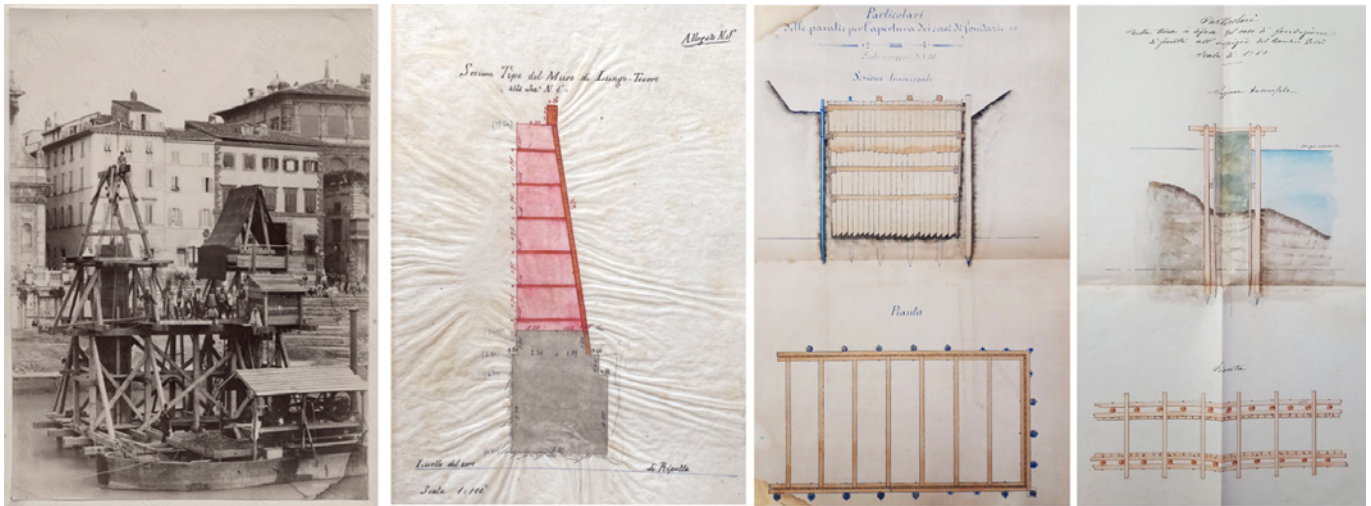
The compressed air tubular piles of the Ripetta bridge foundations: picture of the sinking of the tubular piles [14]; Special Office of the Tiber's settlement, execution drawing of the retaining wall and traditional excavation device for excavation below groundwater level, 1876 (courtesy of Rome State Archive, USTRA collection).
